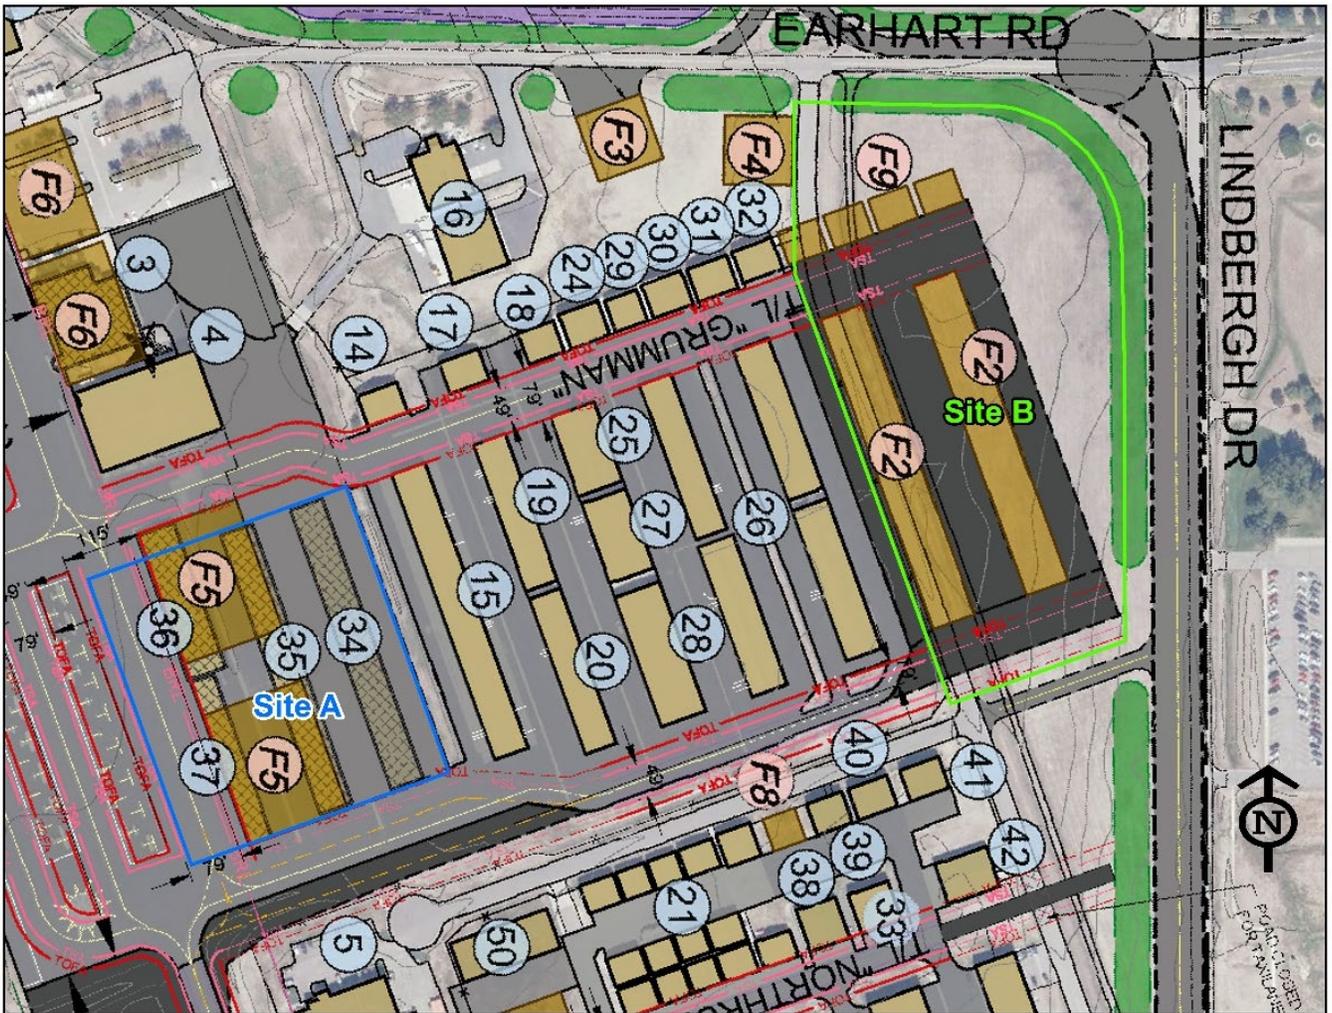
Site A&B Airport Layout Plan from 2020 Northern Colorado Regional Airport Master Plan
